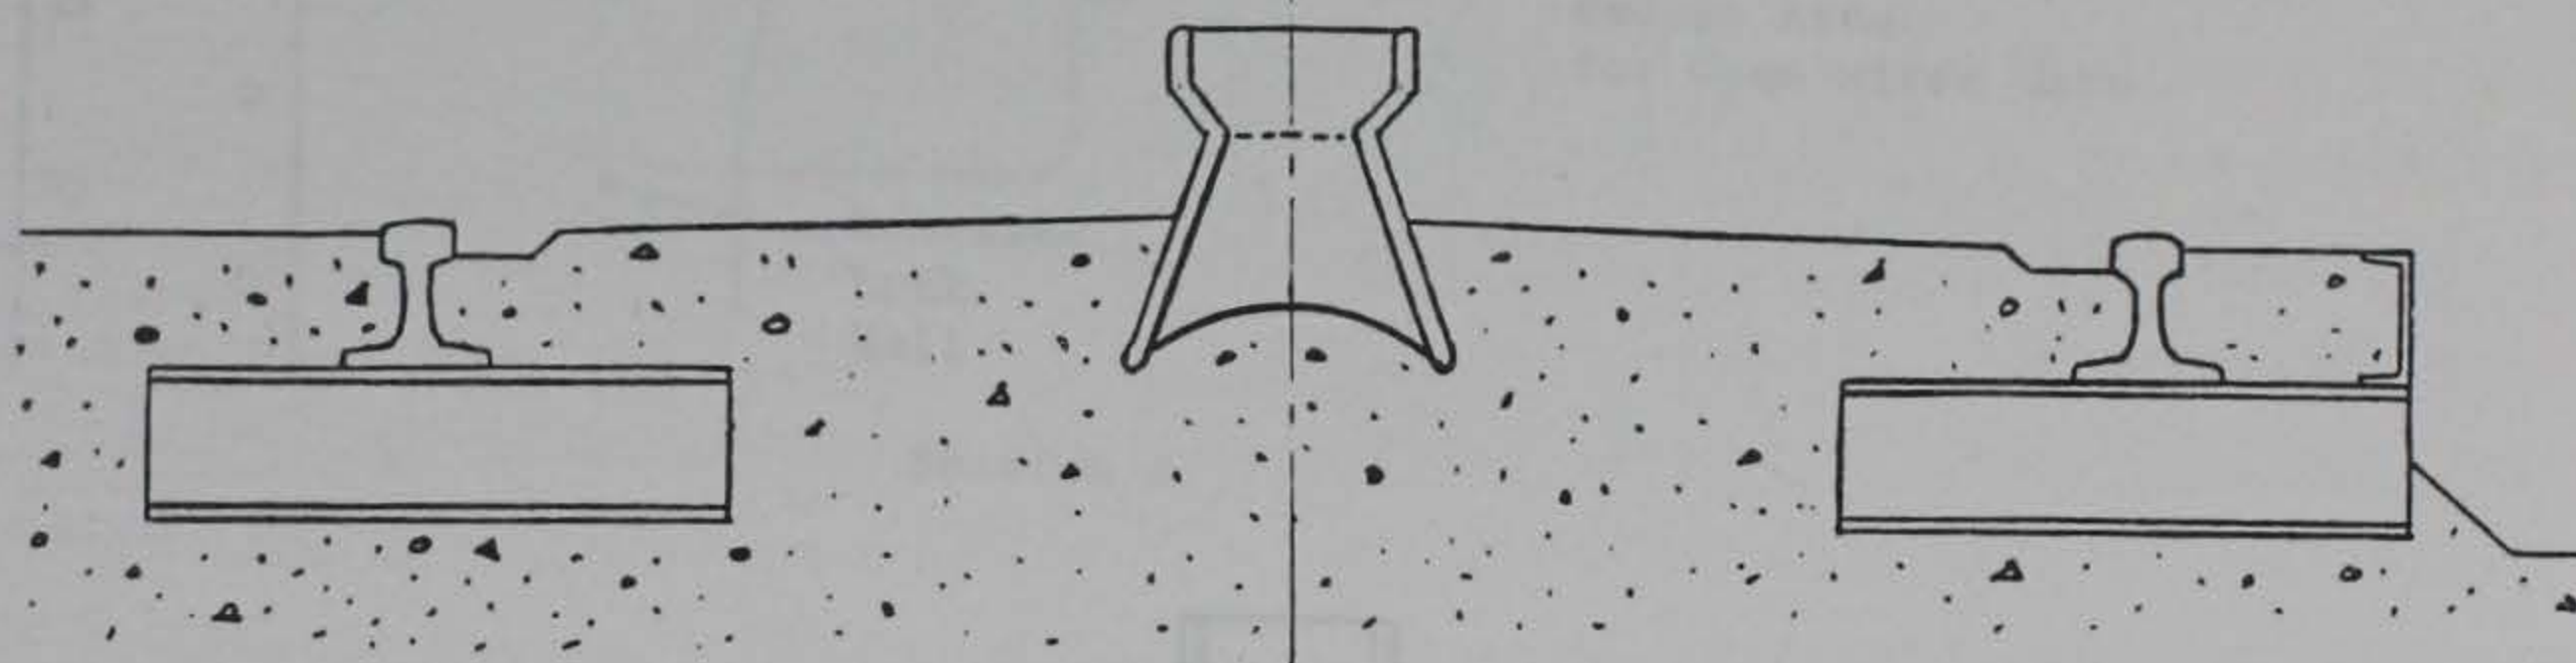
Cutaway sketch of typical concrete foundation tow track section
